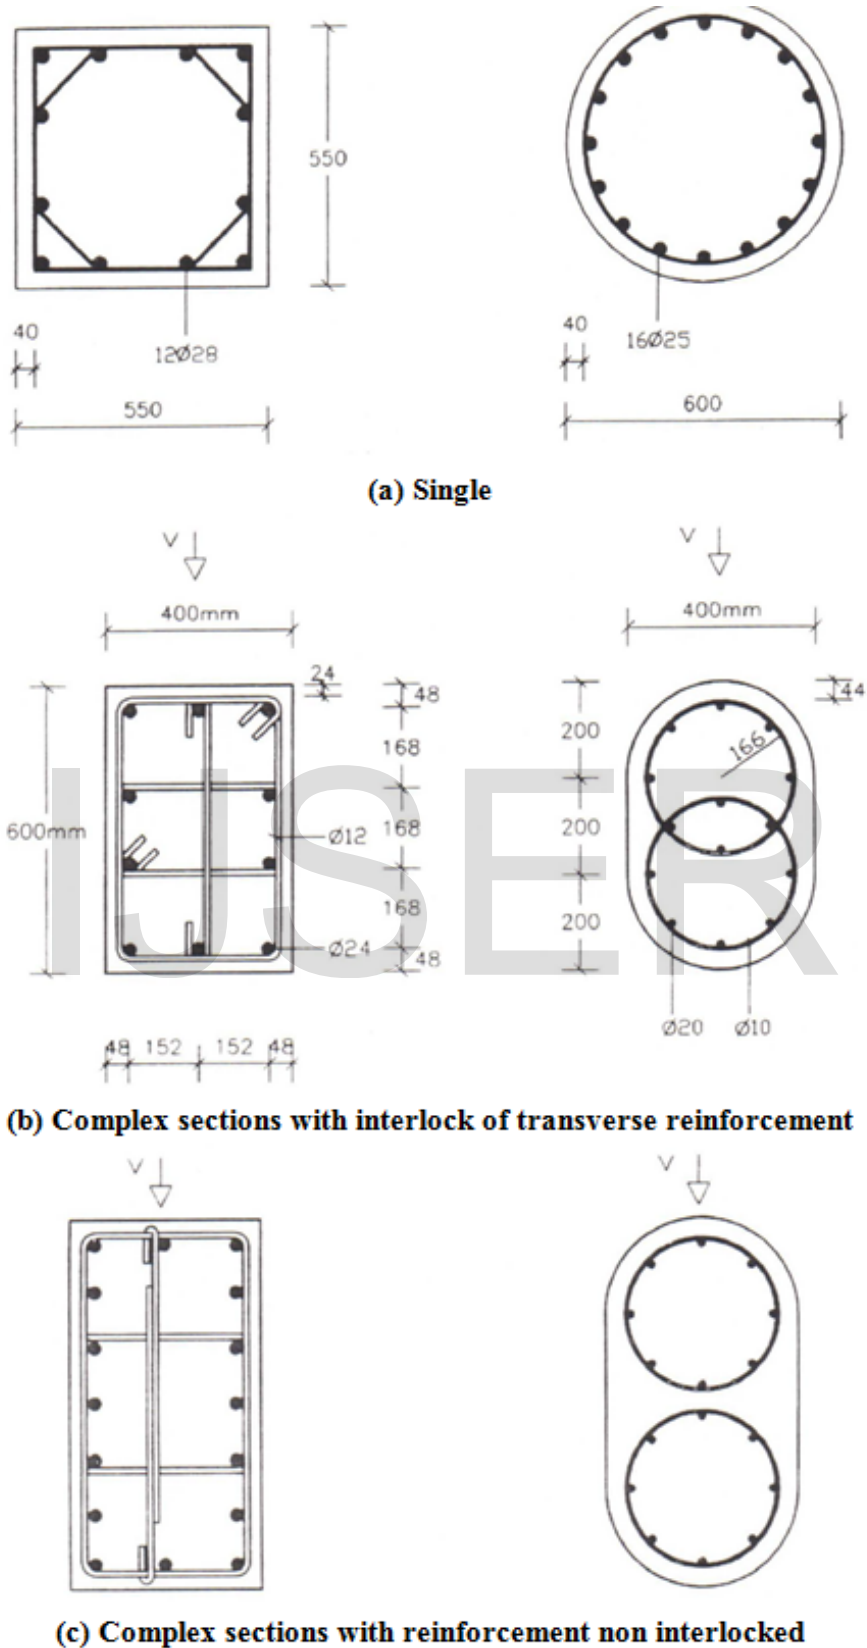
Types of sections: (a) Single section, (b) Complex-section with transverse reinforcement, interlocked and (c) Complex sections with transverse reinforcement, non interlocked.
